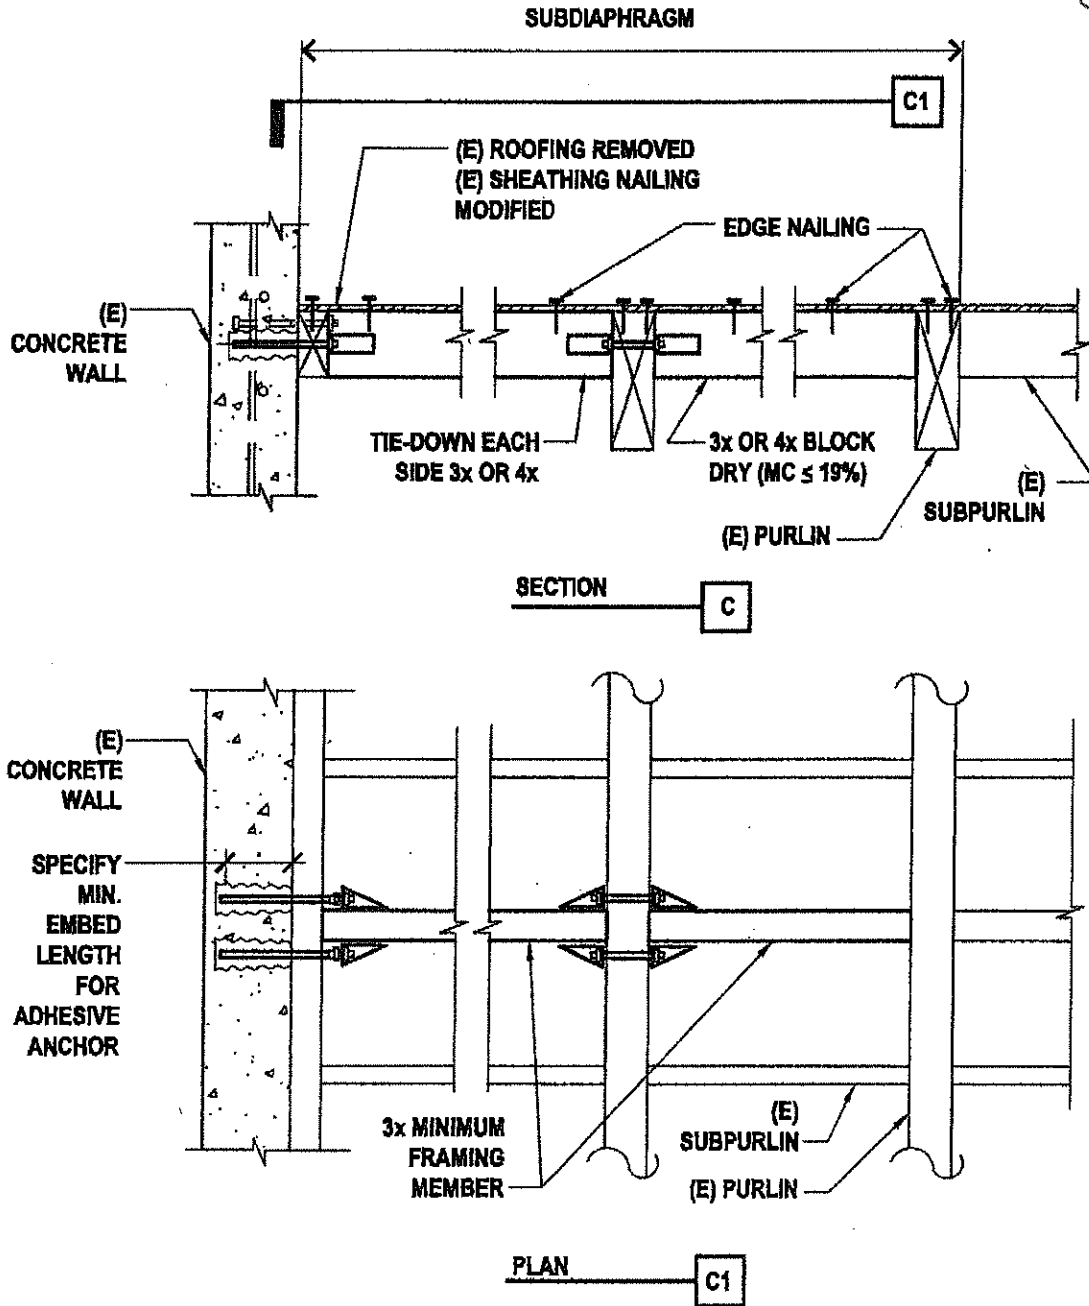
C: Wall Out-of-Plane Anchorage for Flexible Wood Diaphragm at Subpurlins – Roofing Removed
